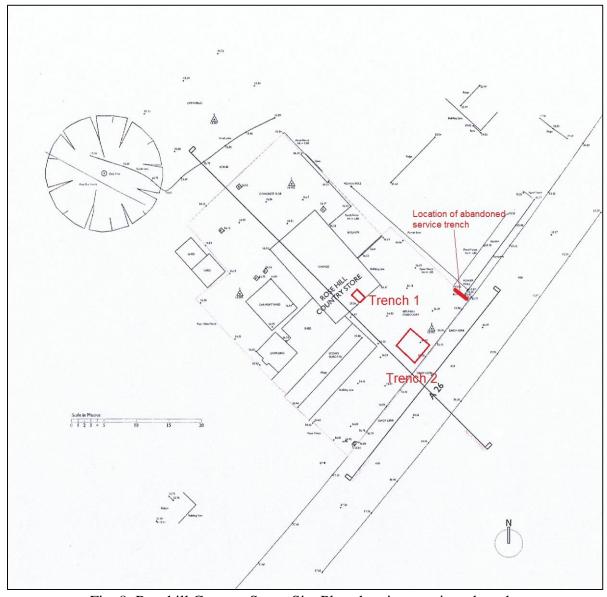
Rosehill Country Store: Site Plan showing monitored works
